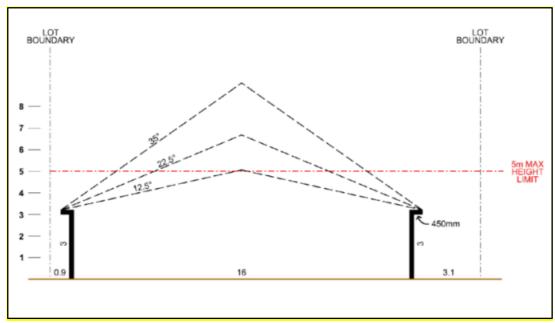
Five (5) metre maximum building height limit compared to roof pitches
